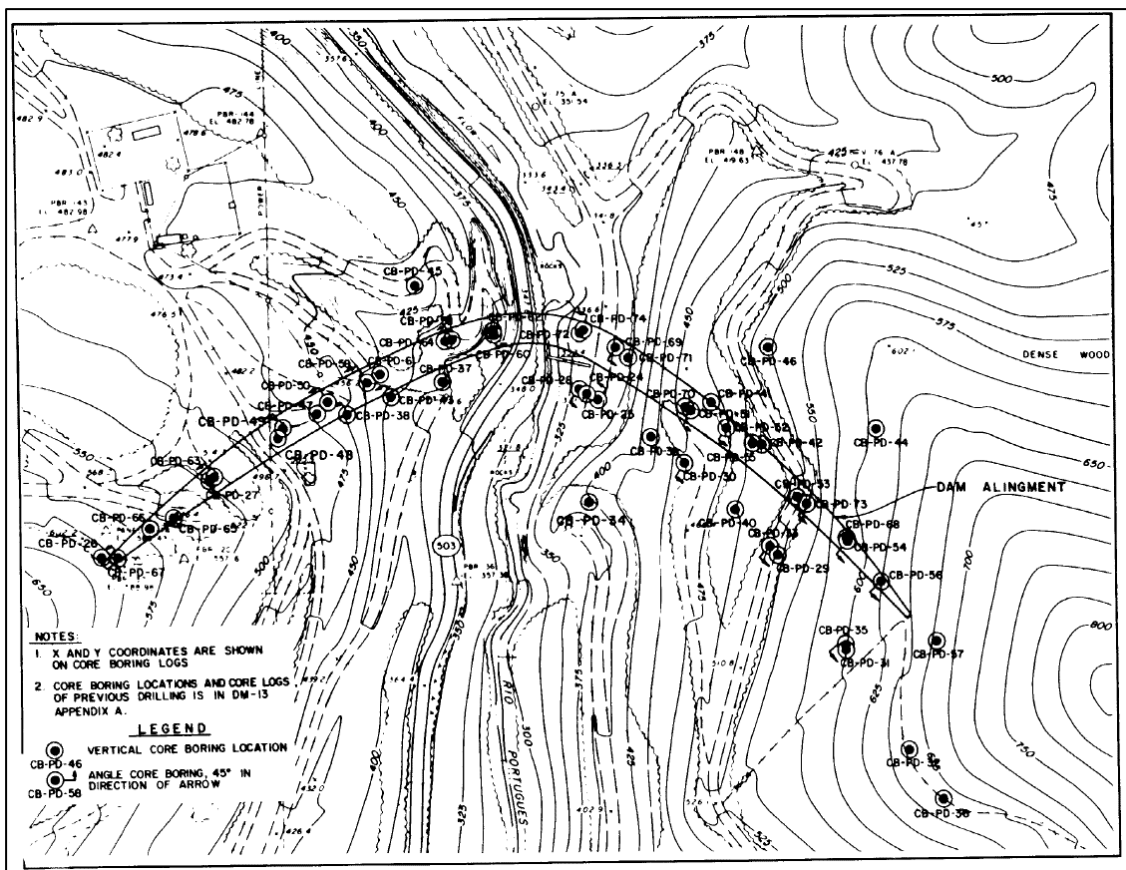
Typical arch dam boring layout plan (USACE, 1994)
